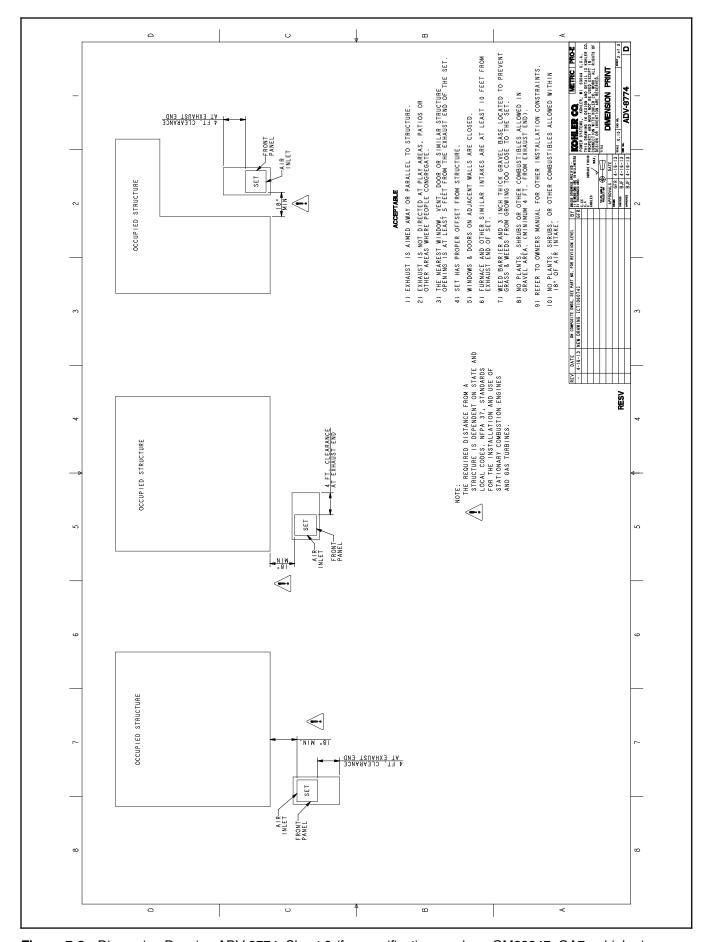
Dimension Drawing ADV-8774, Sheet 3 (for specification numbers GM88347–GA7 or higher)
